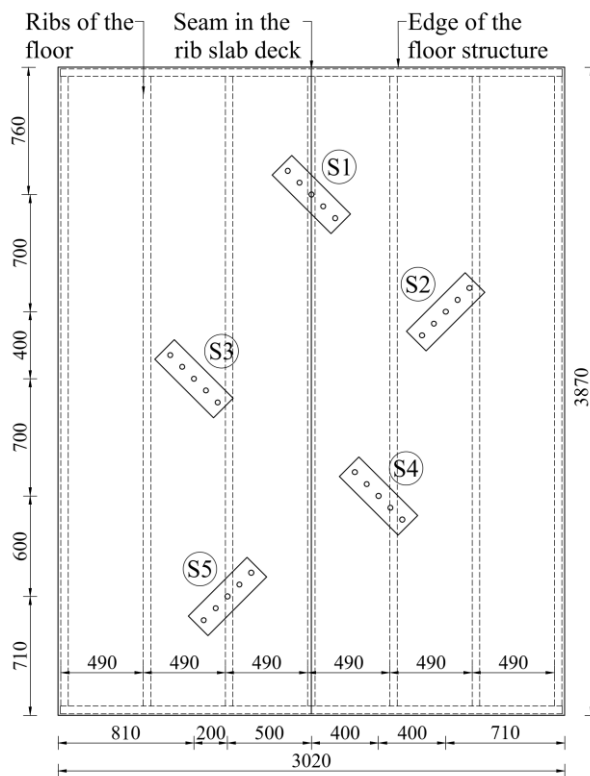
Floor structure F11 and its construction stages F12 and F13. The layers of the floor F11 from top to bottom were: a multilayer parquet (thickness  $h = 14$  mm) on an underlayment ( $h = 3$  mm), two plasterboard layers ( $h = 15.5$  mm), rib slab with a LVL deck ( $h = 27$  mm) and LVL beams ( $h = 260$  mm, width  $b = 45$  mm,  $c/c = 490$  mm), a glass wool layer ( $h = 95$  mm) between the ribs, boards from LVL deck ( $h = 27$  mm,  $b = 100$  mm,  $c/c = 550$  mm) screwed below the ribs, LVL battens from LVL beams ( $h = 45$  mm,  $b = 45$  mm,  $c/c = 490$  mm) screwed to the overhead boards between the ribs, and two plasterboard layers ( $h = 12.5$  mm).
